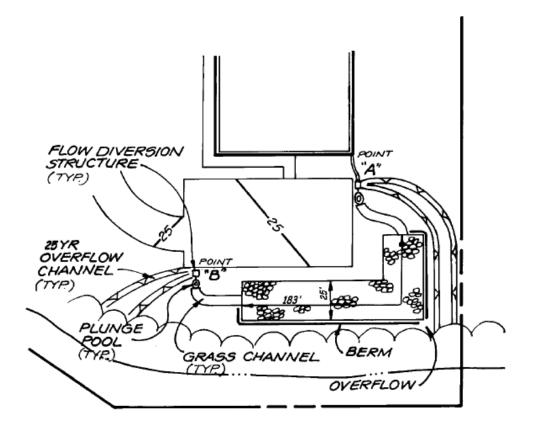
Infiltration Trench Site Plan Source: GSMM (2001)
